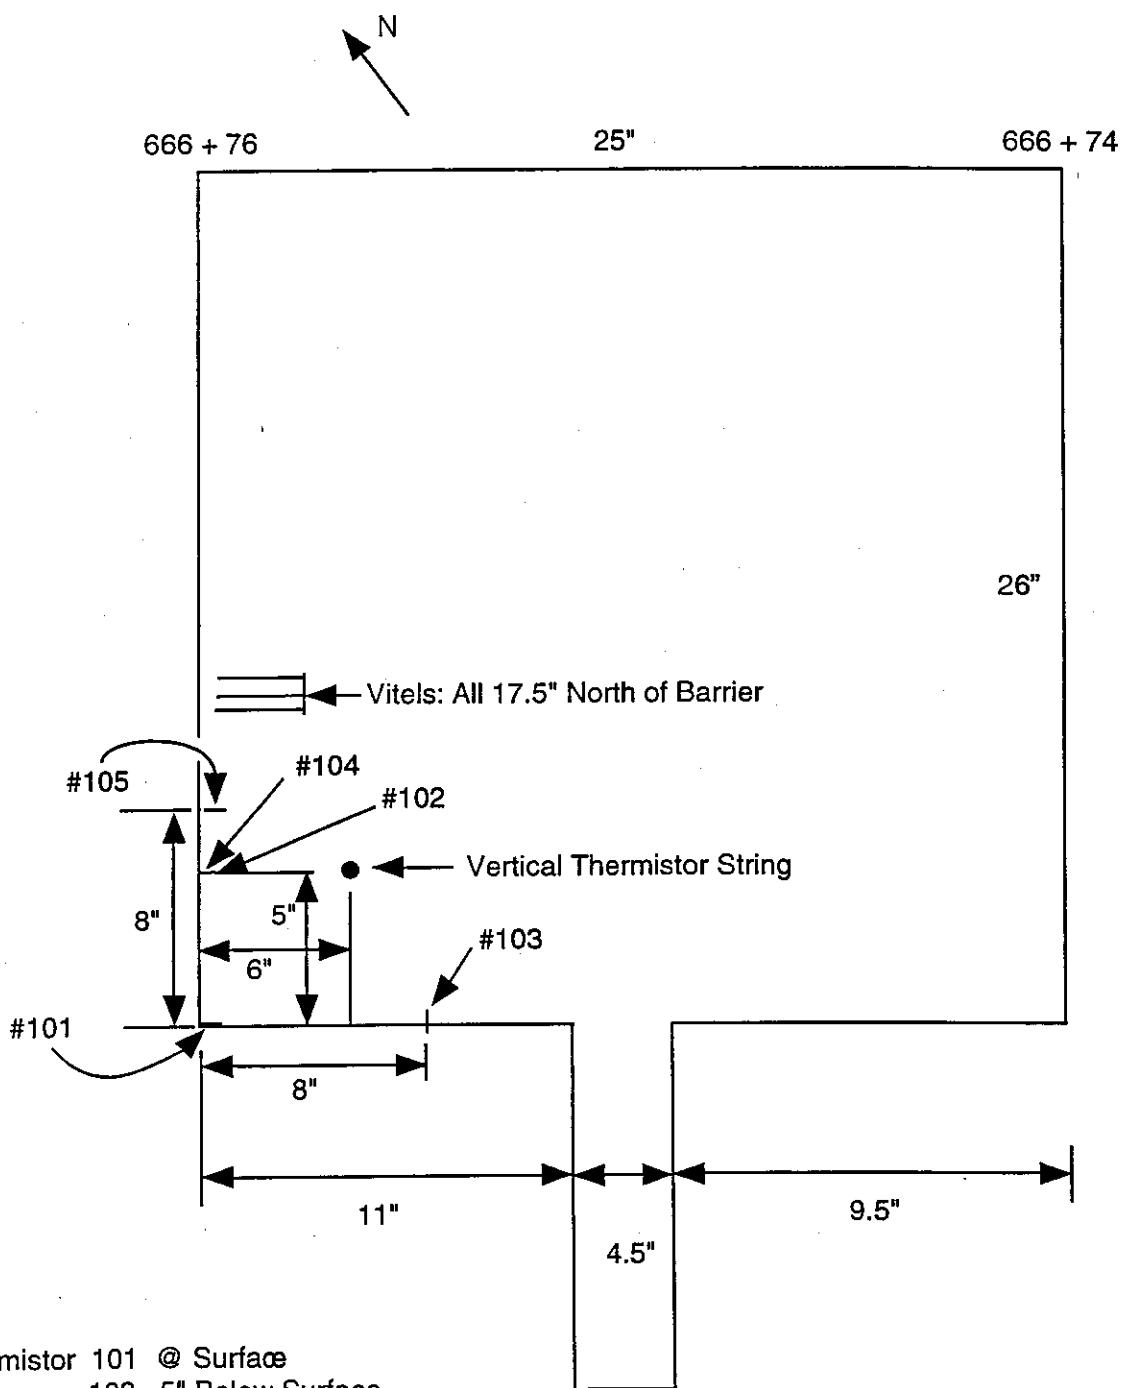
Plan View of Site 2 - Asphalt Stabilized Base
